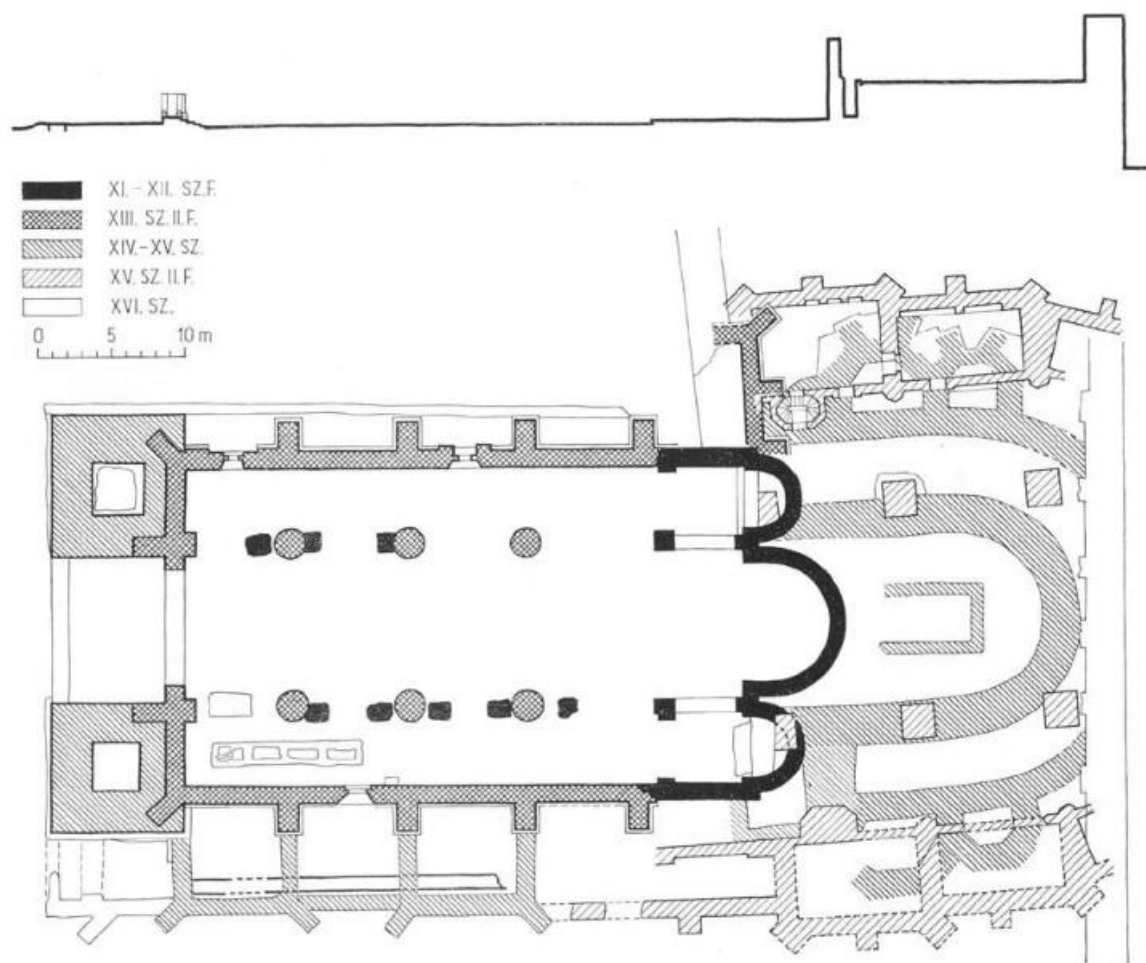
Eger Cathedral, excavation plan depicting different building periods
